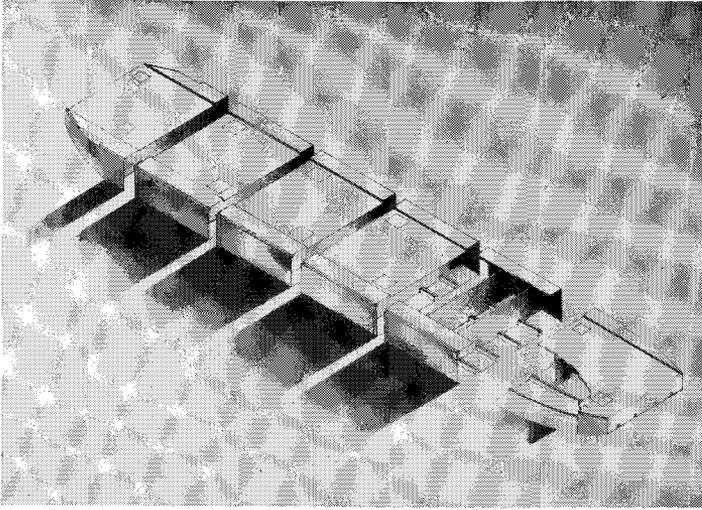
Segmental construction of prestressed concrete barges (USSR)
